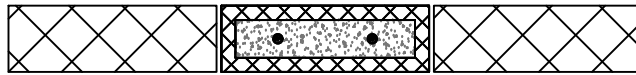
B - WALL JUNCTION WITH DEBONDED TIE - SECTIONAL PLAN
